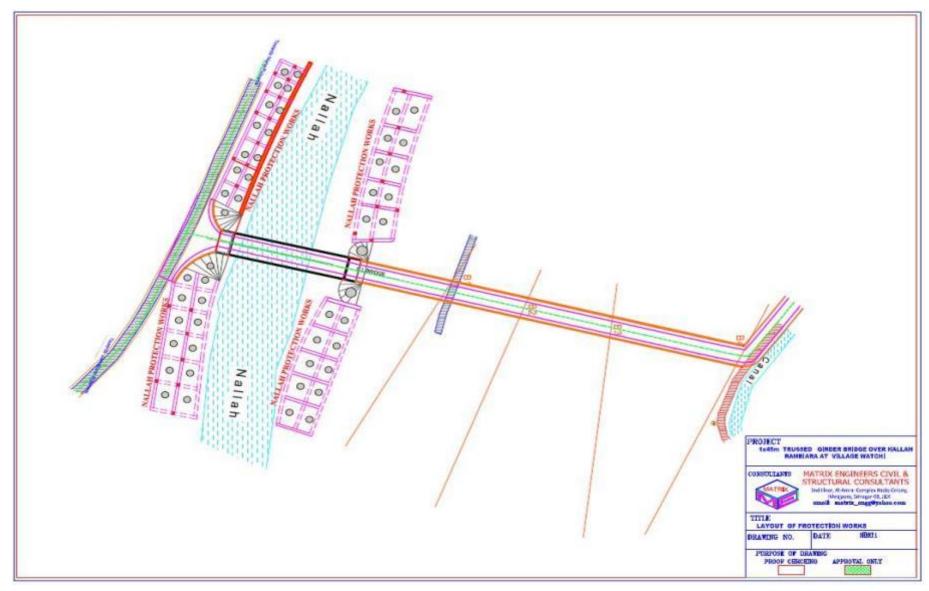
Drawing showing Nallah Protection Works on both sides of the Wachi Bridge.
